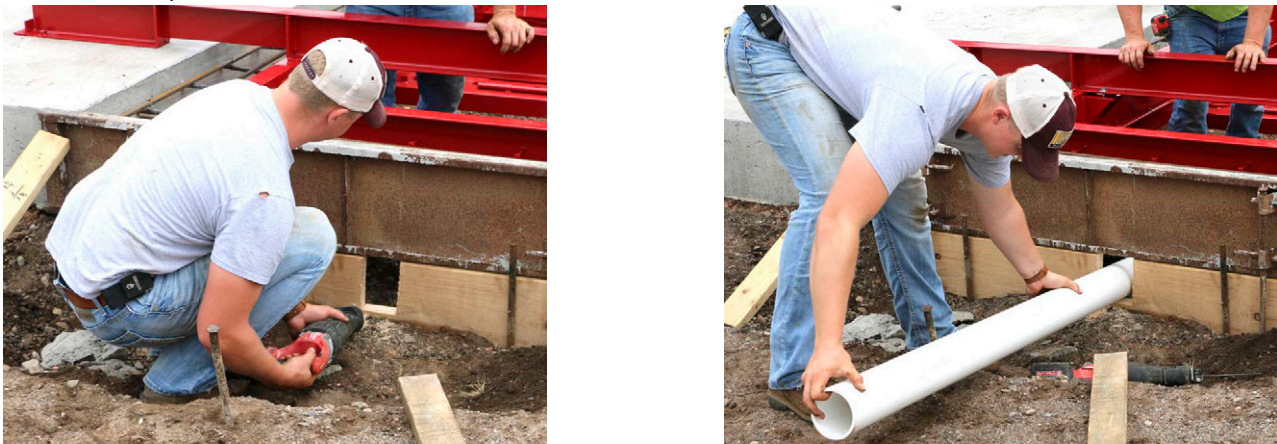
Prepare Opening for Drains and Cabling Conduits
